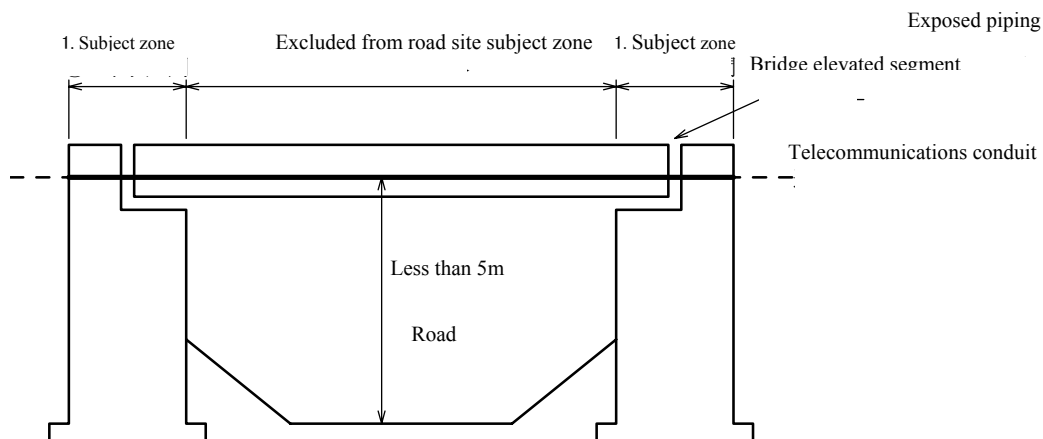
Less than 5m height to conduit and where slope with grass space outside road site could be exposed to spreading fire
